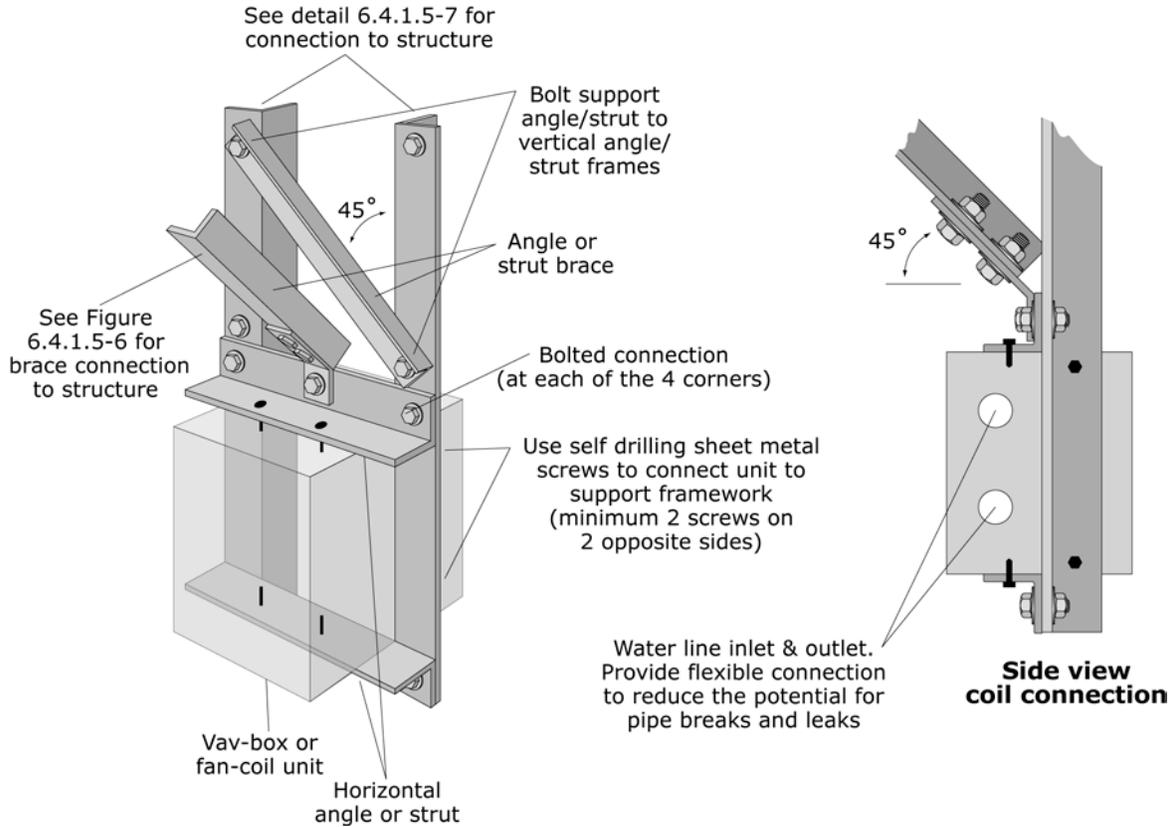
HVAC equipment suspended in-line with ductwork (ER).
